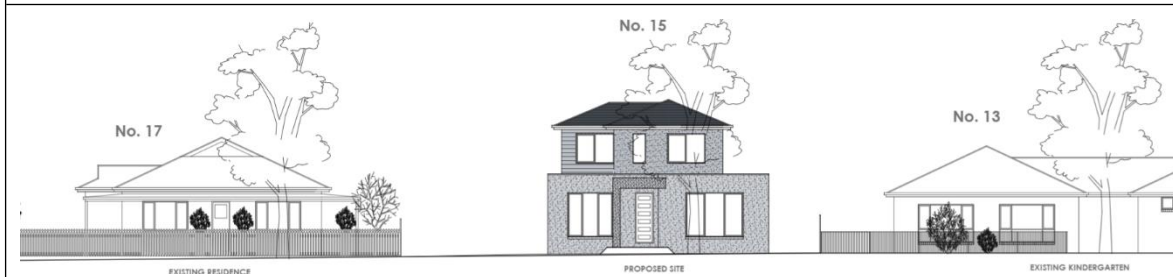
Advertised streetscape plan showing Dwelling 1 as double storey
